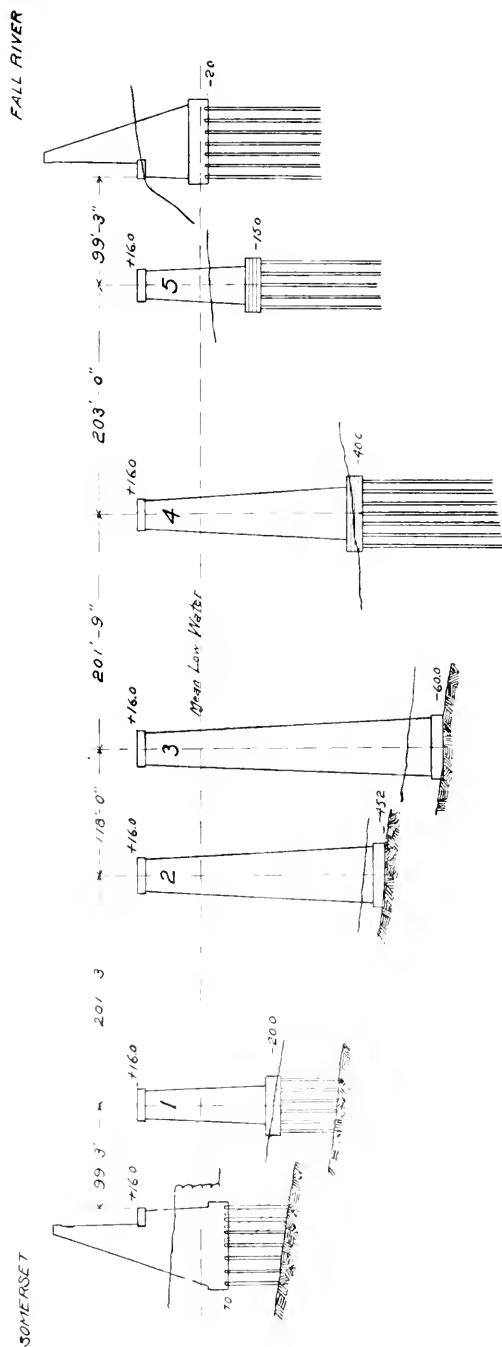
CONTRACT PLAN FOR THE FALL RIVER BRIDGE.
